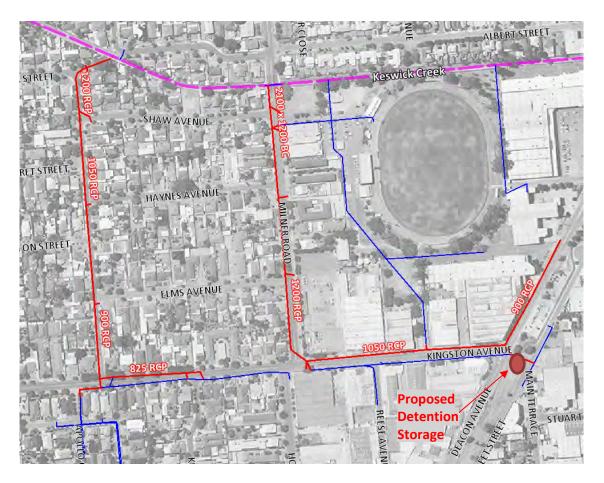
Milner Road and Arthur Street Drainage Layout
